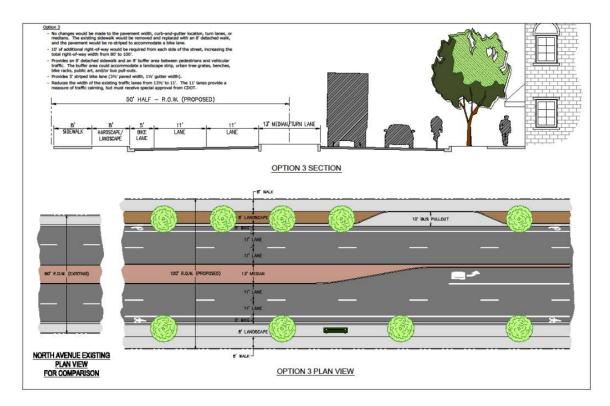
2011 North Avenue West Corridor Plan Recommended Typical Section
